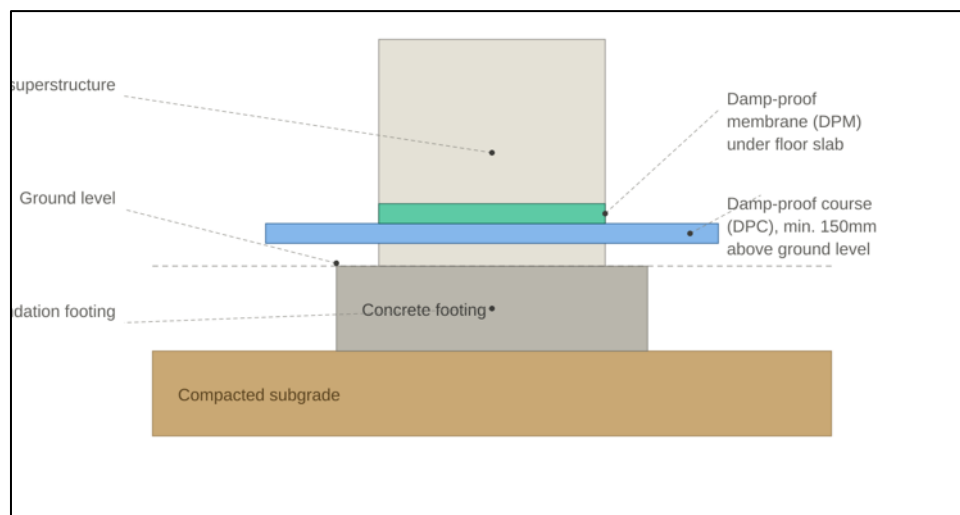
Schematic detail of damp-proof course (DPC) and damp-proof membrane (DPM) placement (illustrative diagram)
